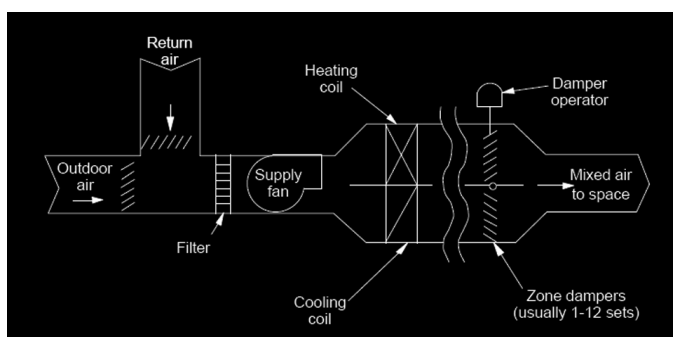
Central air handling unit for a building with more rooms (Bloomquist, 1977)
